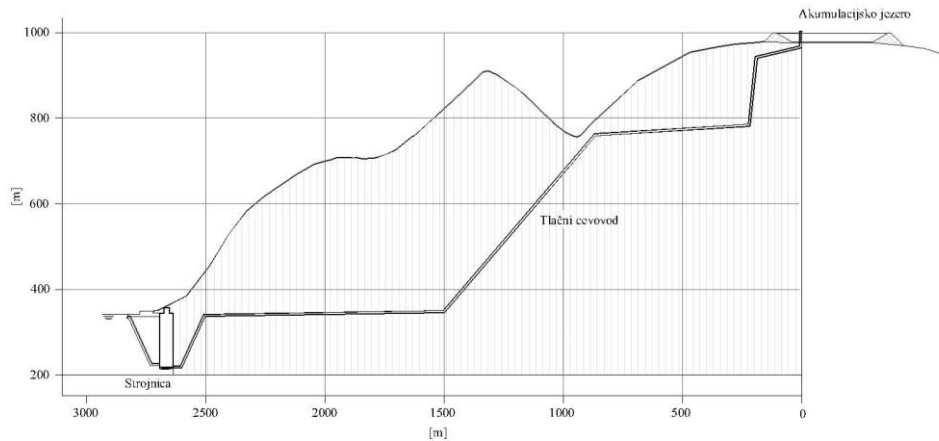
Longitudinal section of the steel penstock Kozjak.
